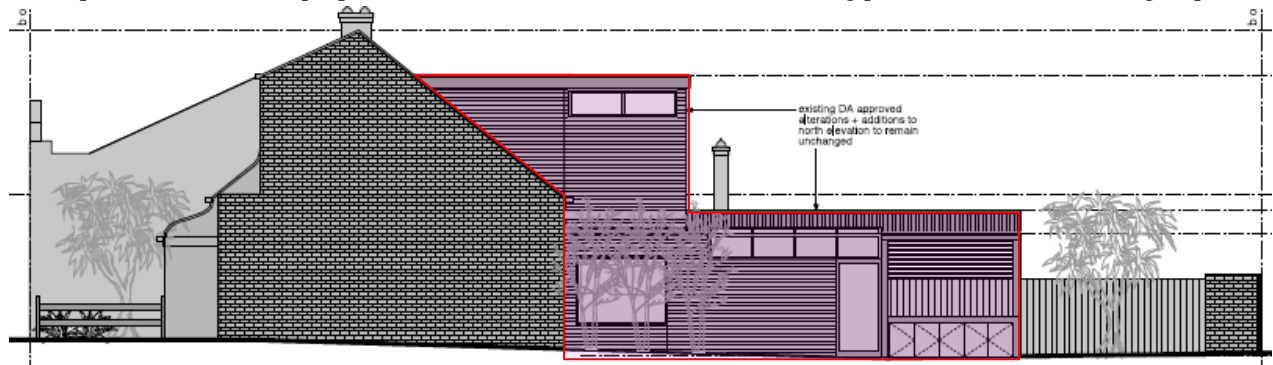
Recent sympathetic additions to the rear of adjoining terrace at No 37 Pittwater Road outlined. Source: Harriet Weir Arch.
